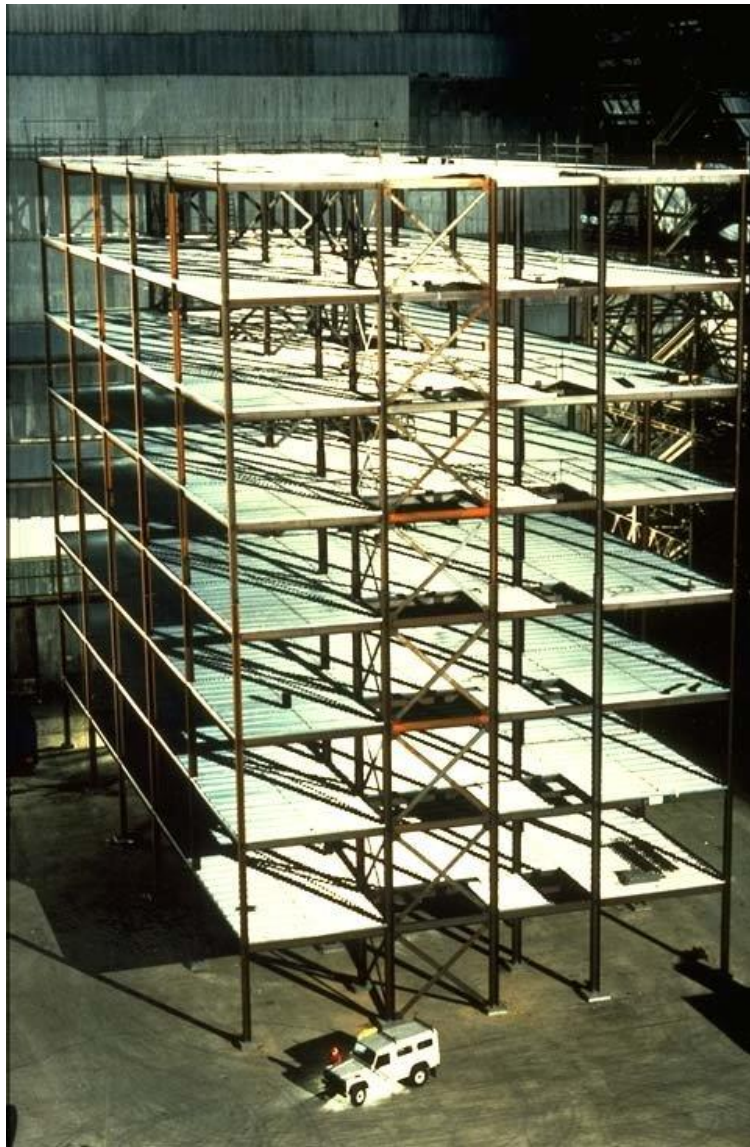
Cardington test building prior to the concreting of the floors [15]
